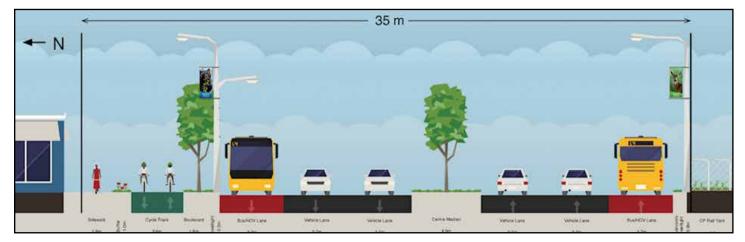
Lougheed Highway Typical Cross Section - Oxford Street to Sherling Avenue
